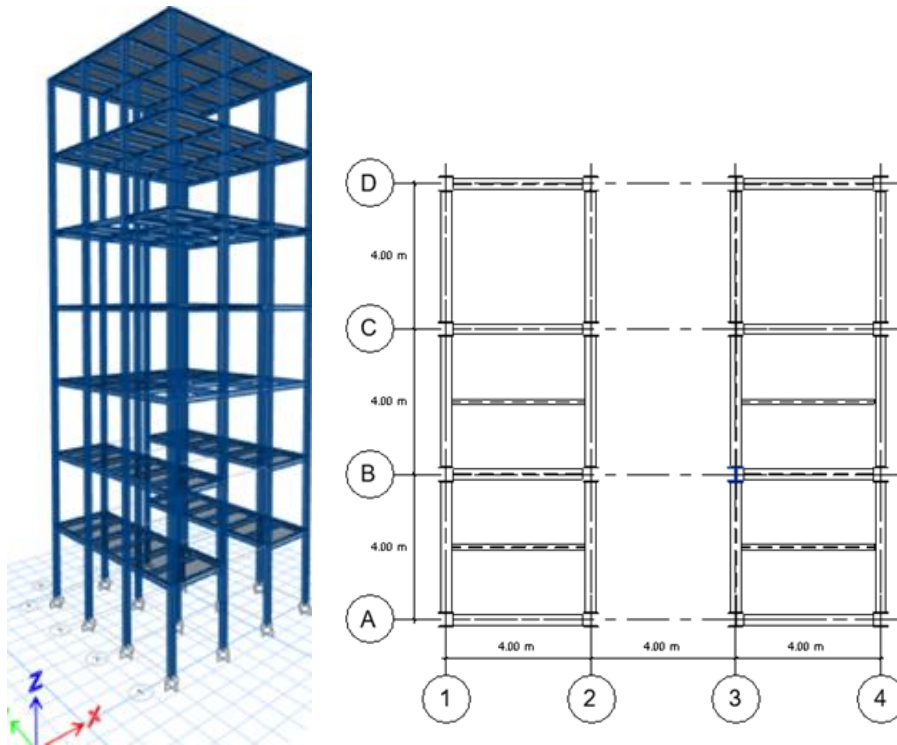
7-Story Mid-Rise Steel Building Modelling and First-Floor Plan
